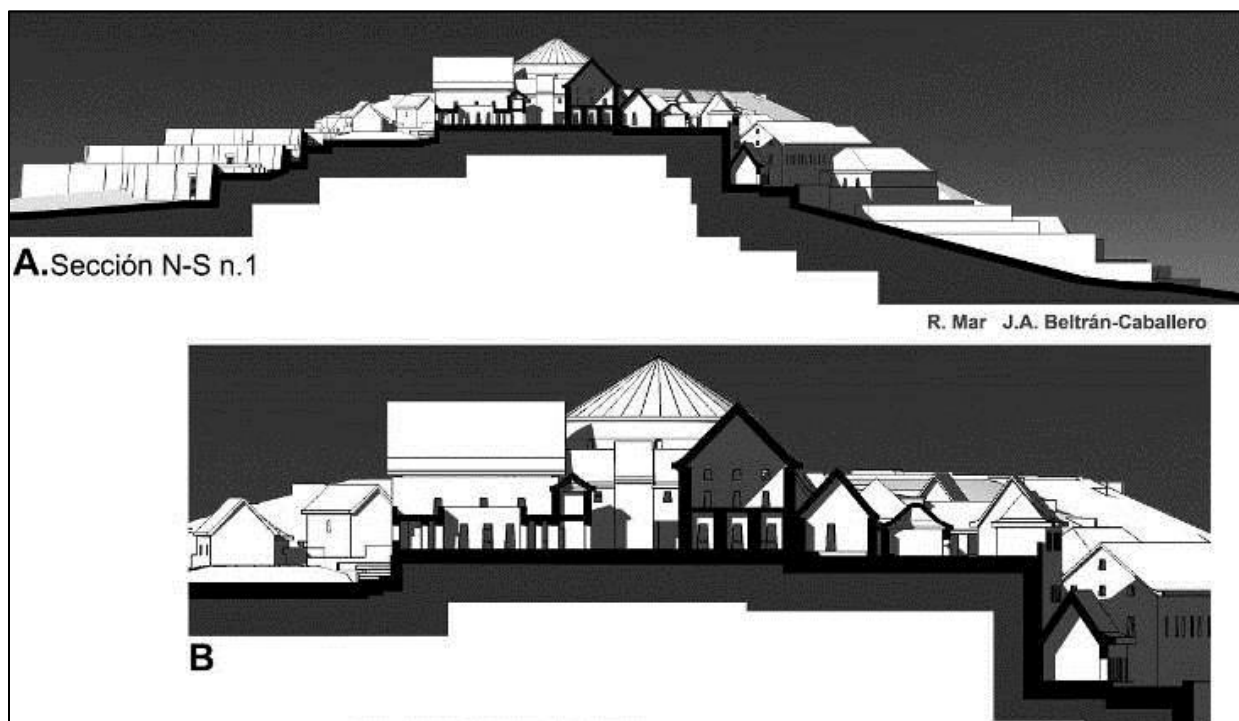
Digital reconstructions of the towers sector and the north and south terrace profiles at Sagsaywaman (Mar & Beltran-Caballero, 2014)
